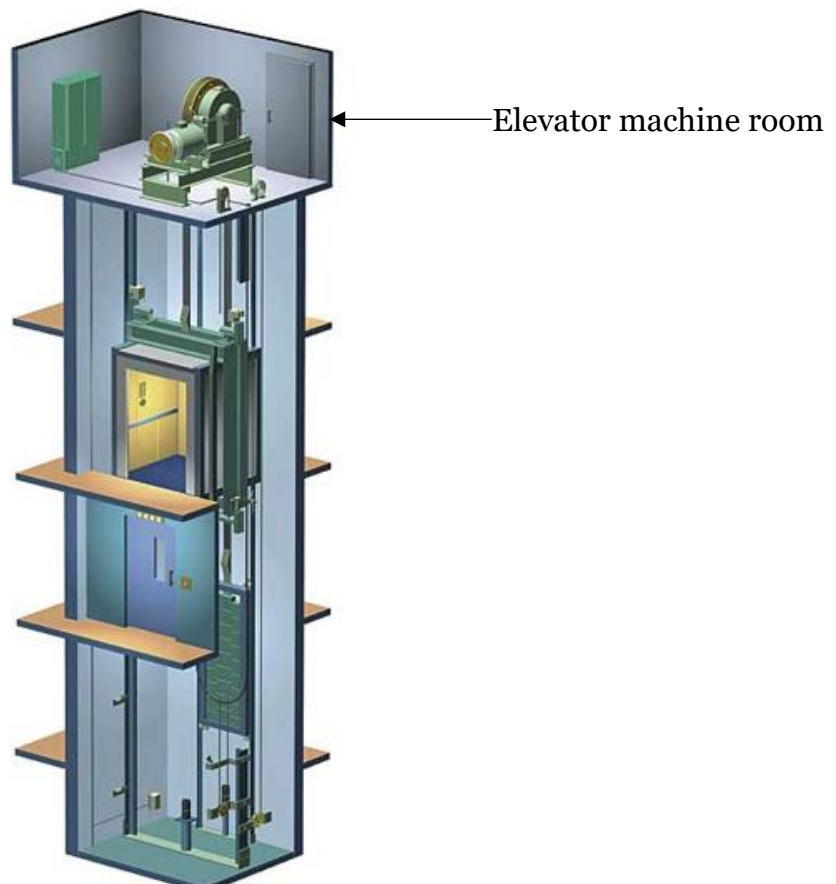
Elevator machine room in a typical elevator system (Makaa, 2017)
